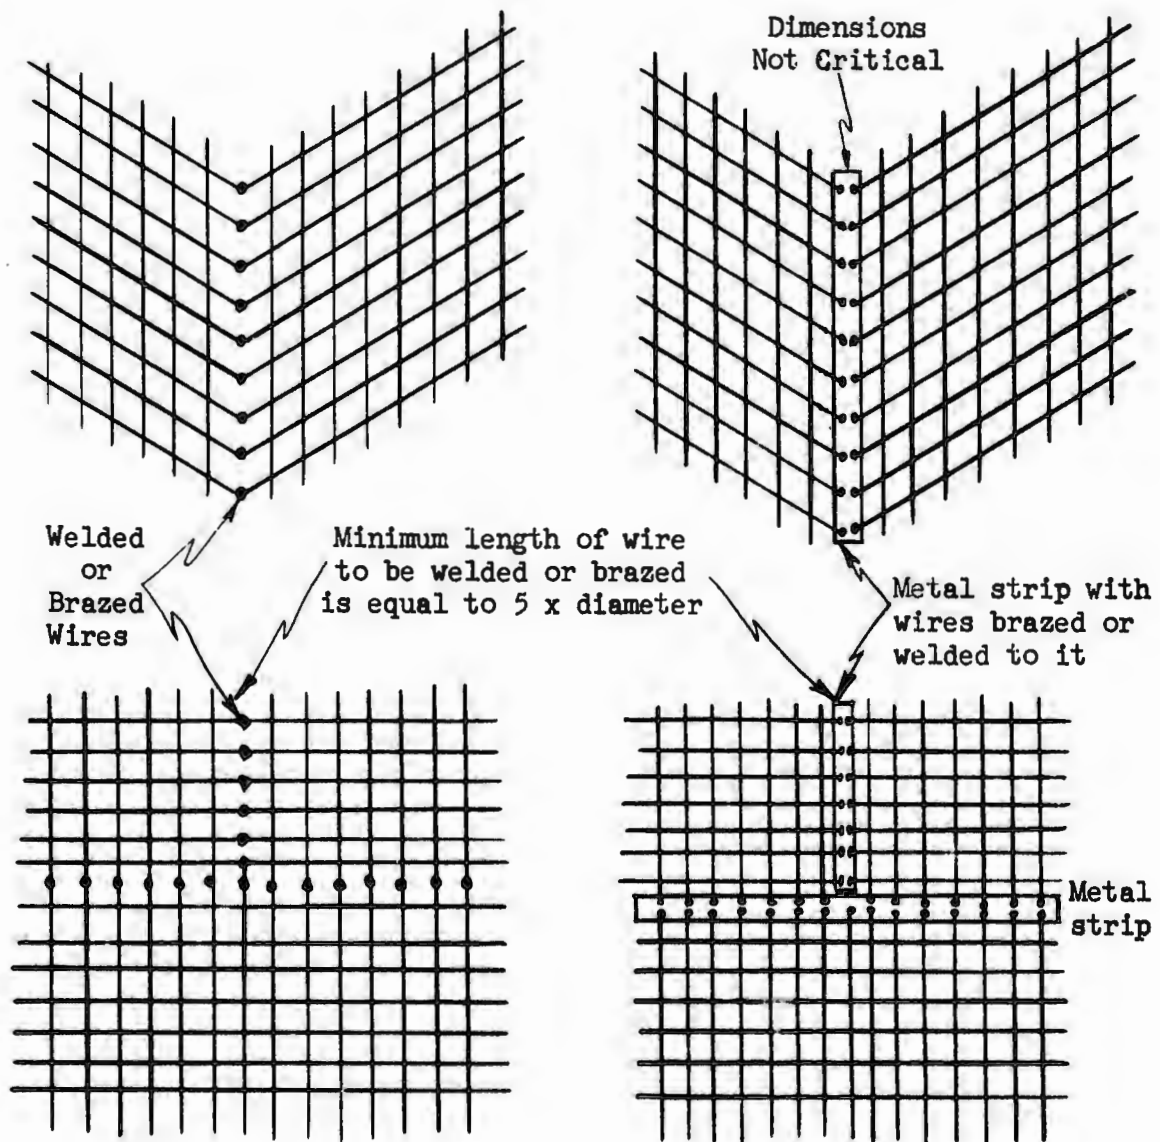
Welded Wire Fabric Connections
